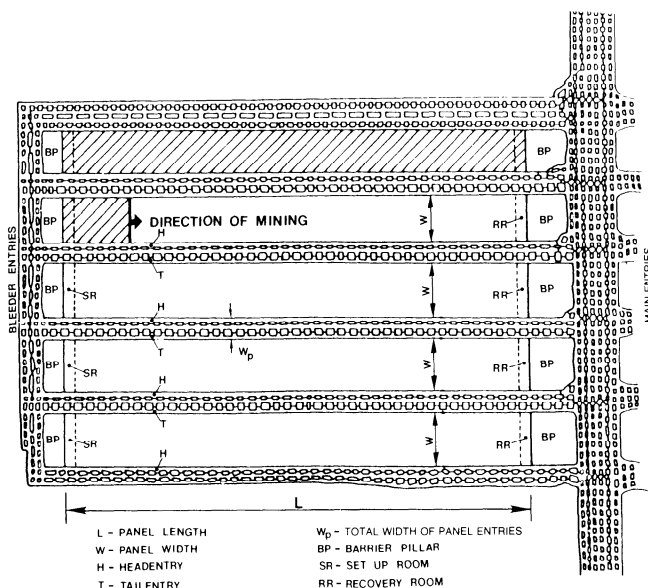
Typical US longwall panel layout (Peng and Chiang, 1984. By permission from John Wiley & Sons, Inc., New York).
